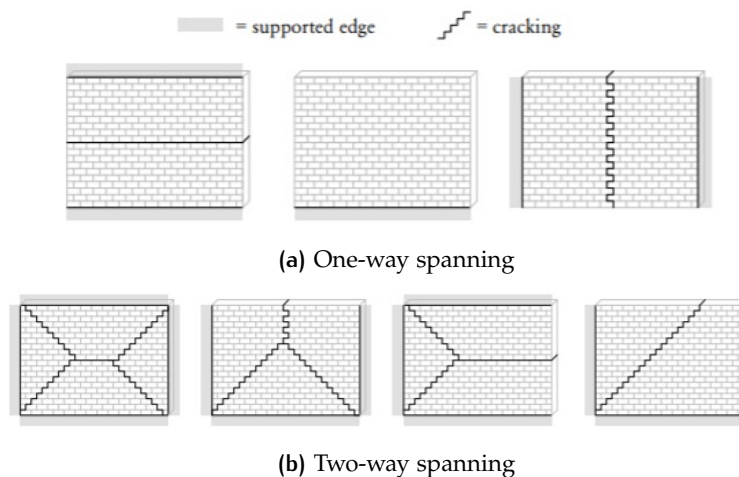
Cracking pattern wall loaded out-of-plane.
